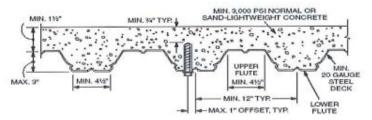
INSTALLATION IN THE SOFFIT OF CONCRETE OVER PROFILE STEEL DECK FLOOR AND ROOF ASSEMBLIES (LOWER FLUTE)
